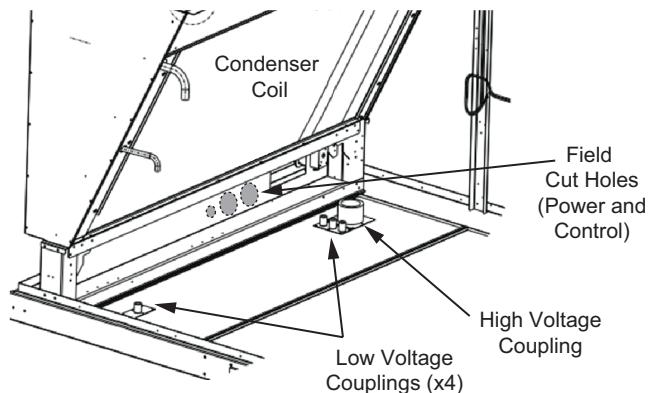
Basepan Coupling Locations and Side Knockouts for Power and Control Wiring
